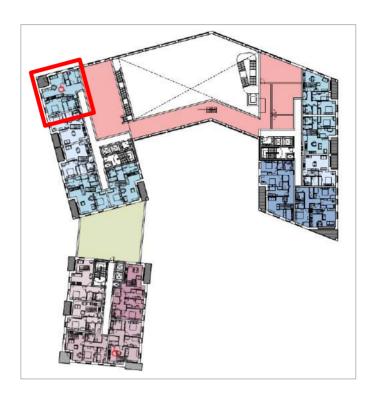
Block C, 1st floor selected 2bed dwelling on the nosy façade (Patel Taylor drawings 21.09.2020).
